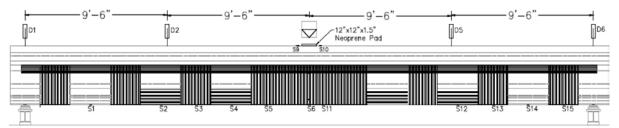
Fatigue loading setup arrangement for full-scaled AASHTO PSC girders
